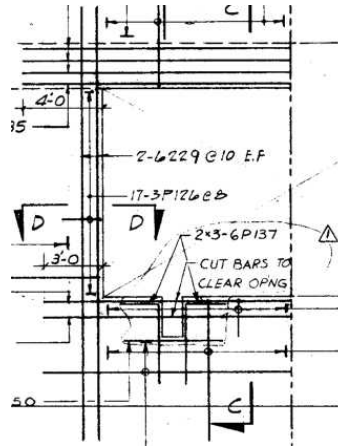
Reinforcement detail of the first storey opening (Plan 3516-0000-4200-4).
